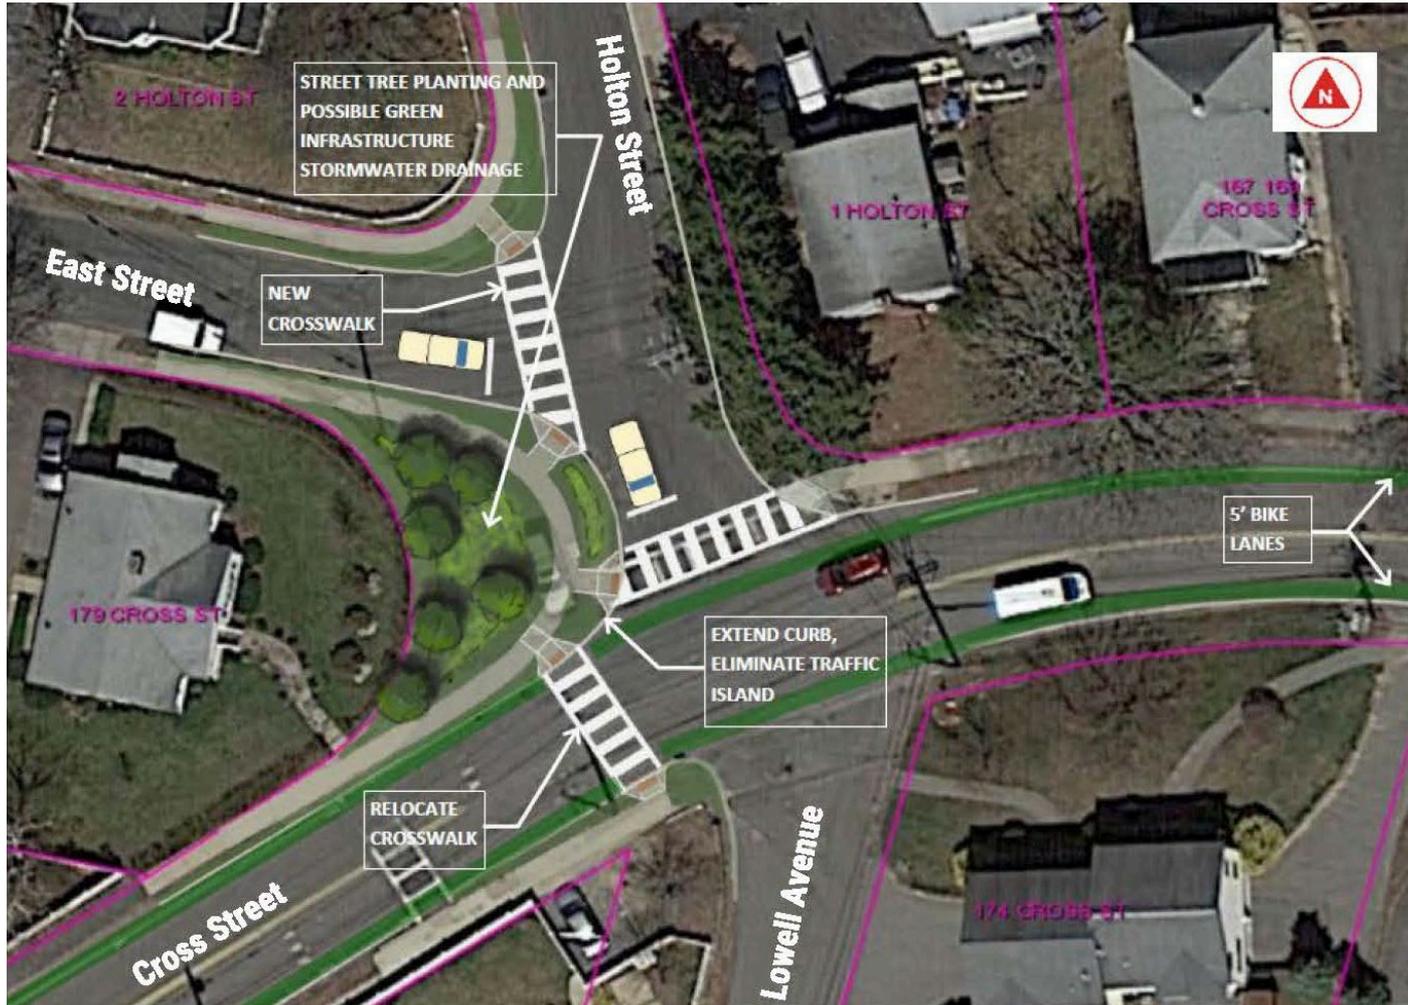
Cross Street at Holton Street/East Street and Lowell Avenue Concept
